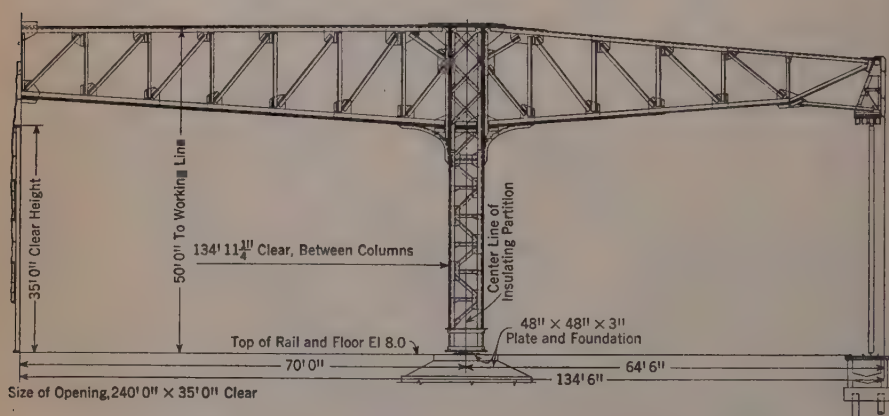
DESIGN OF SEAPLANE HANGAR; HALF-SECTION SHOWING TYPICAL TRUSS
